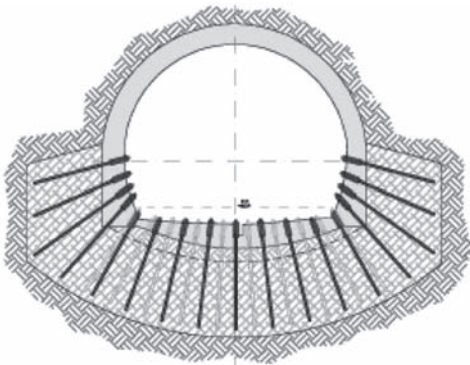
Freeze pile layout and tunnel cross-section. (Pigorini et al).
